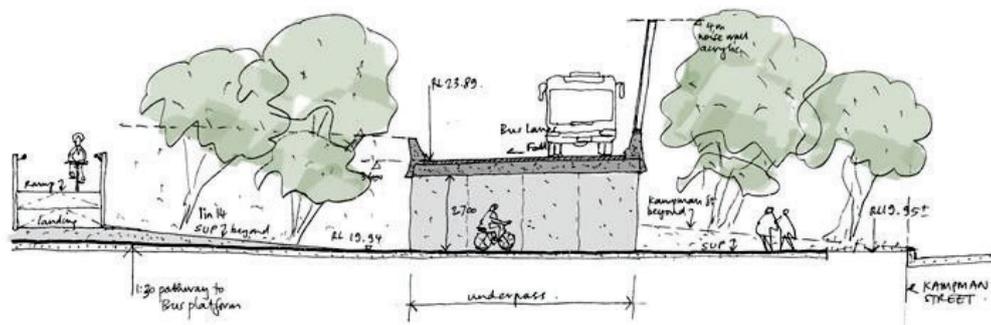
Section through the shared use path looking north (from UDLP drawing 26)
